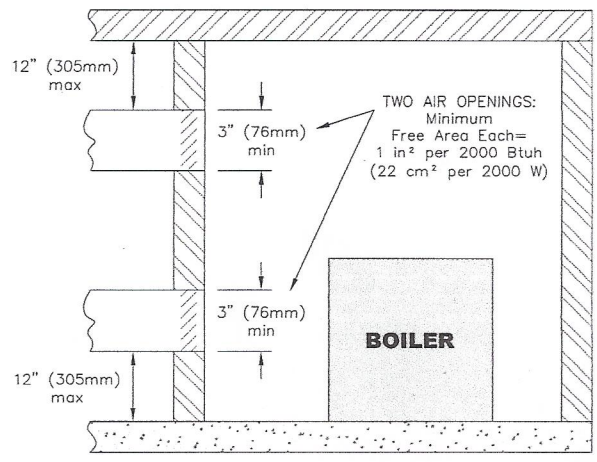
Air Openings - All Air from Outdoors through Horizontal Ducts
